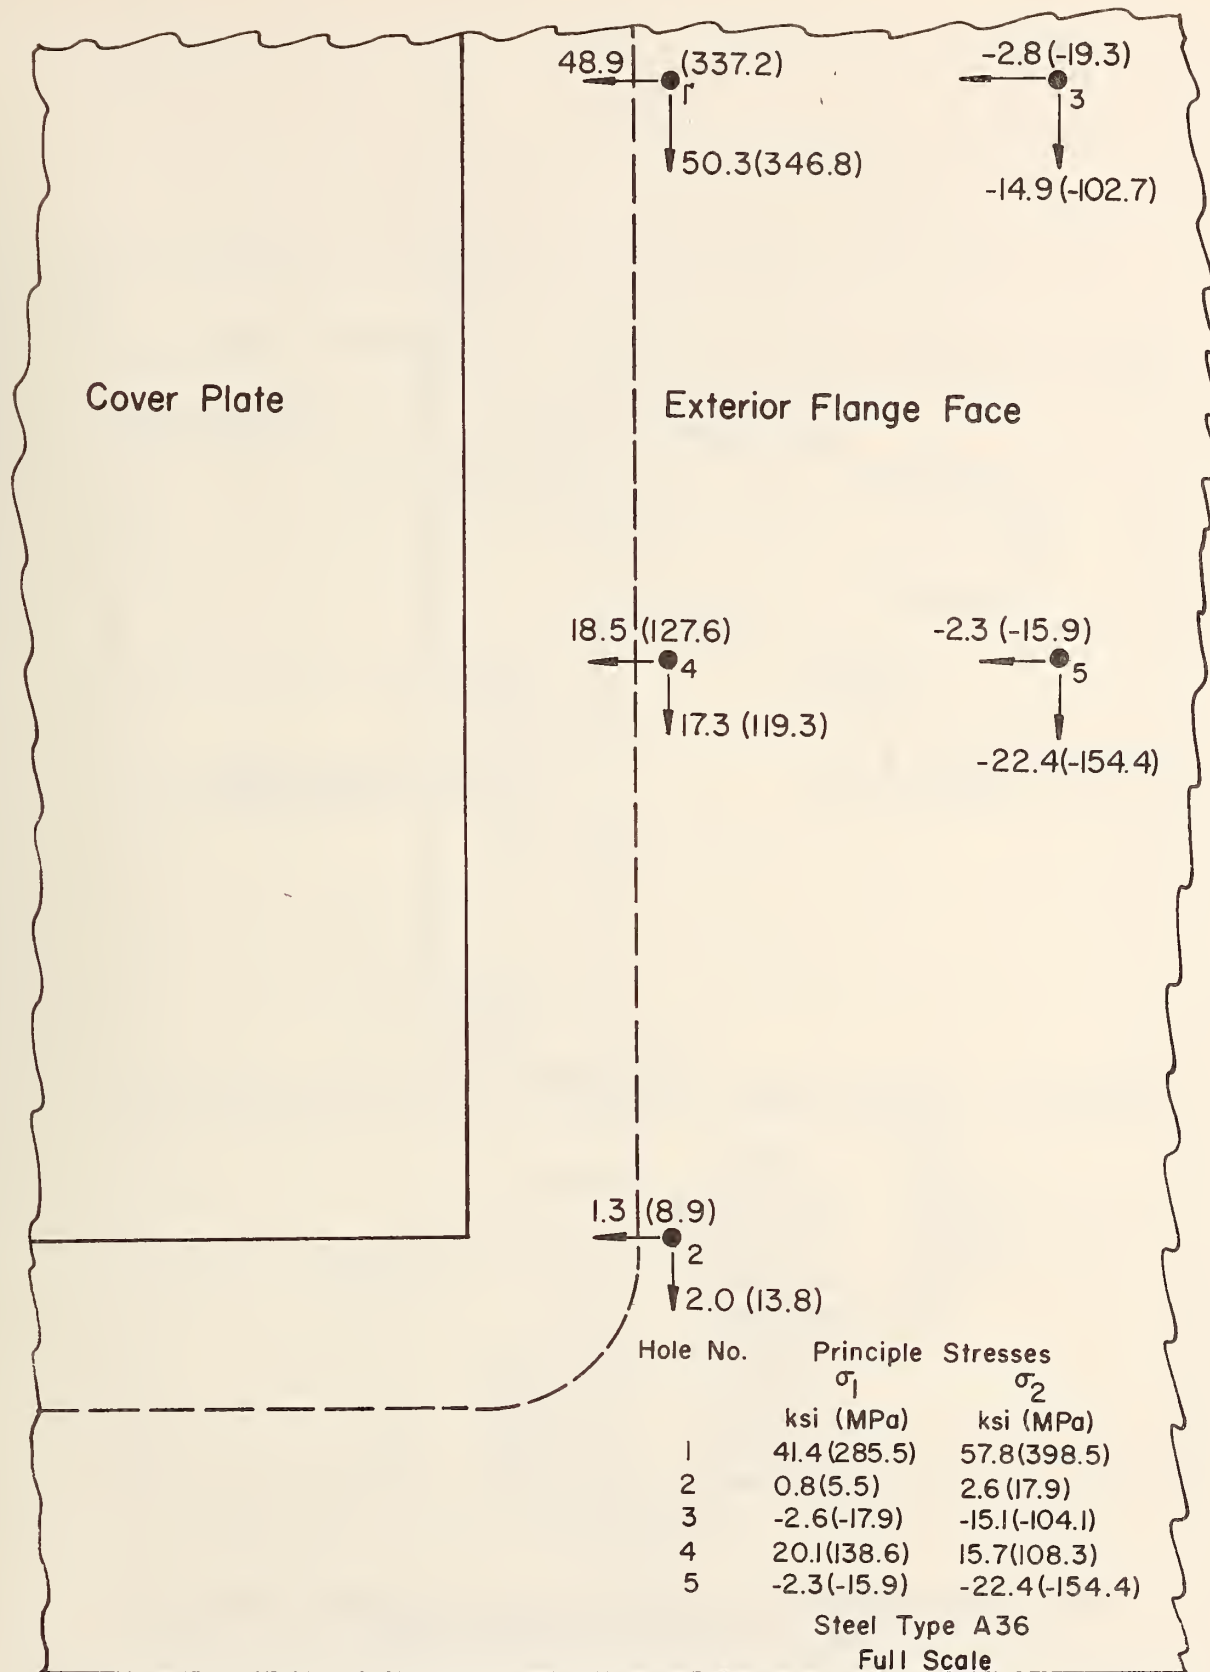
End-Welded Cover Plate Surface Residual Stress (Exterior Flange Face)
